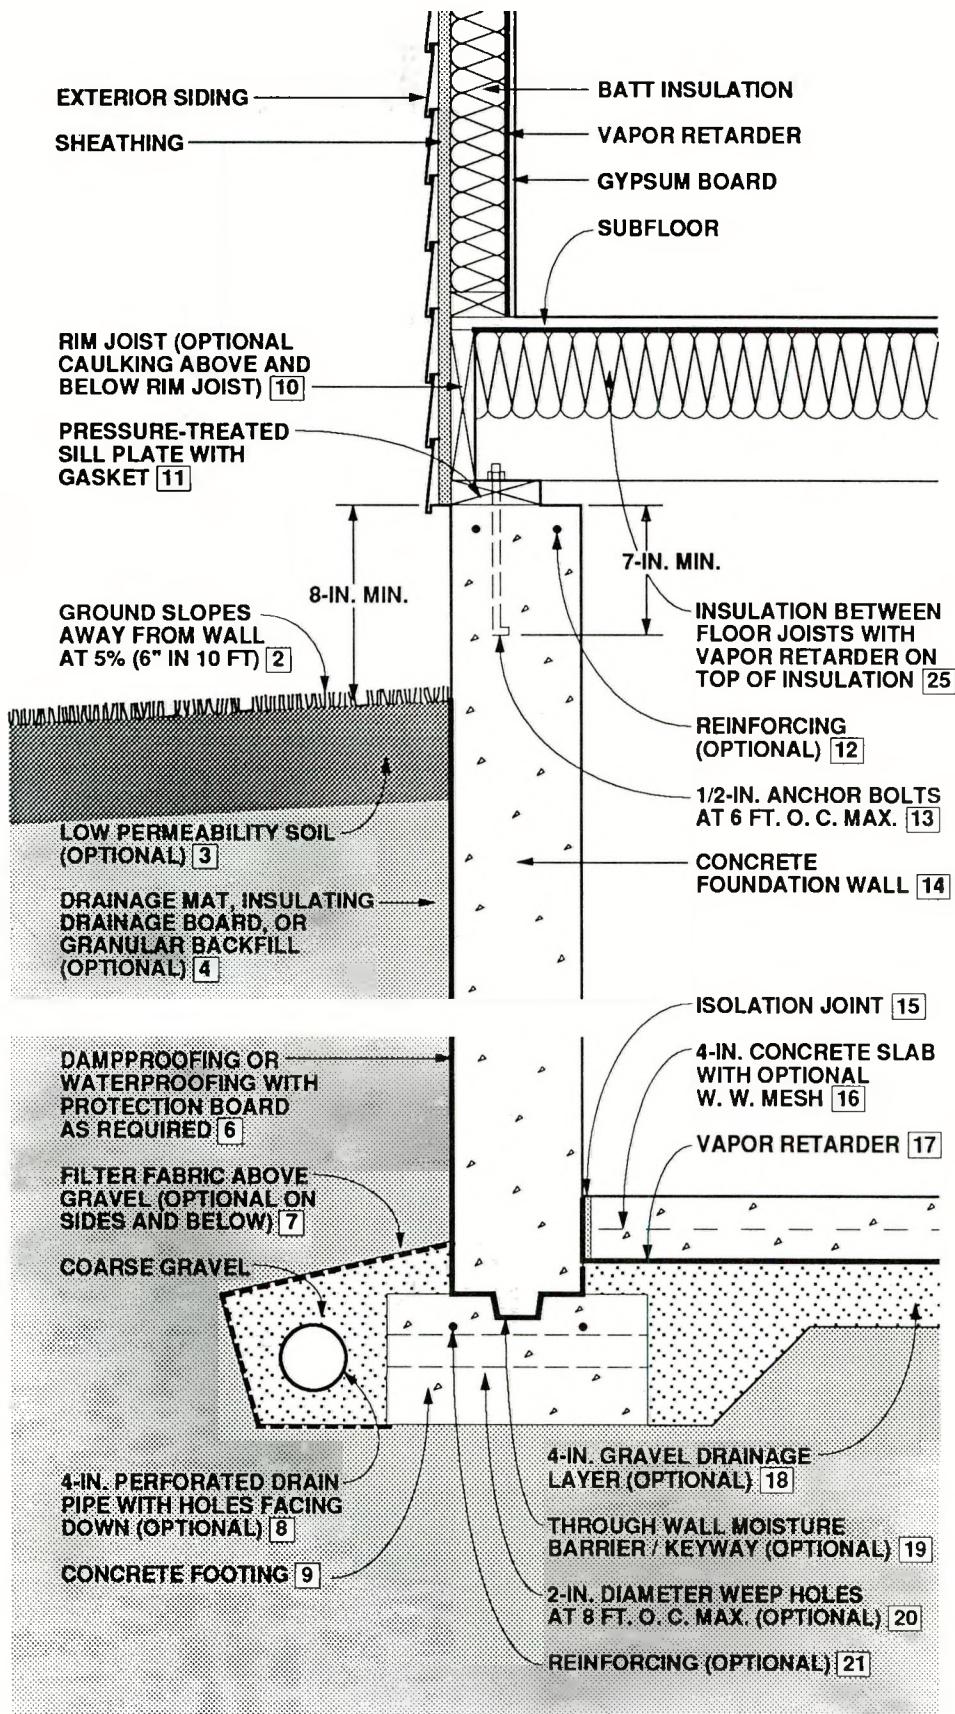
Concrete Basement Wall with Ceiling Insulation
